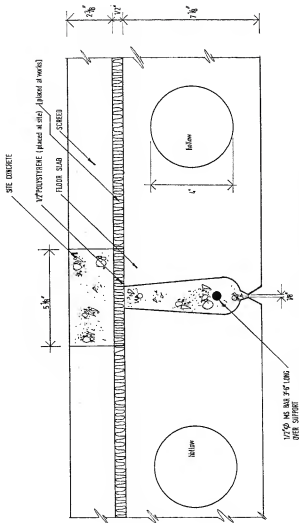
Figure E. Joint H.3. Horizontal joint between adjoining floor slabs
